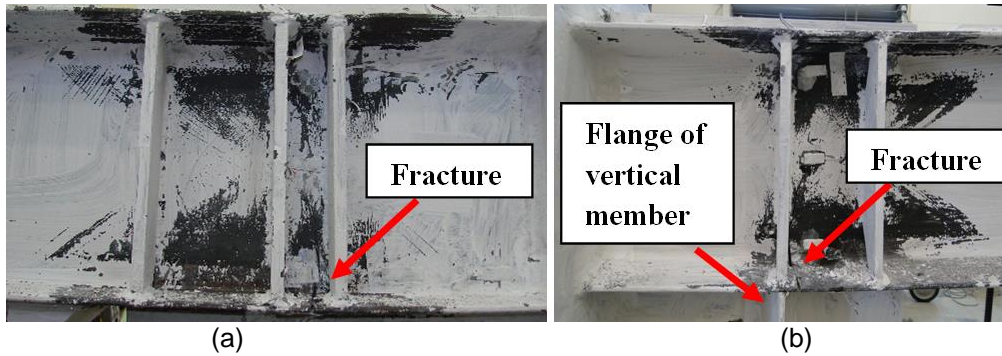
Fracture in (a) specimen 2C12-5 and (b) specimen 2C12-6
